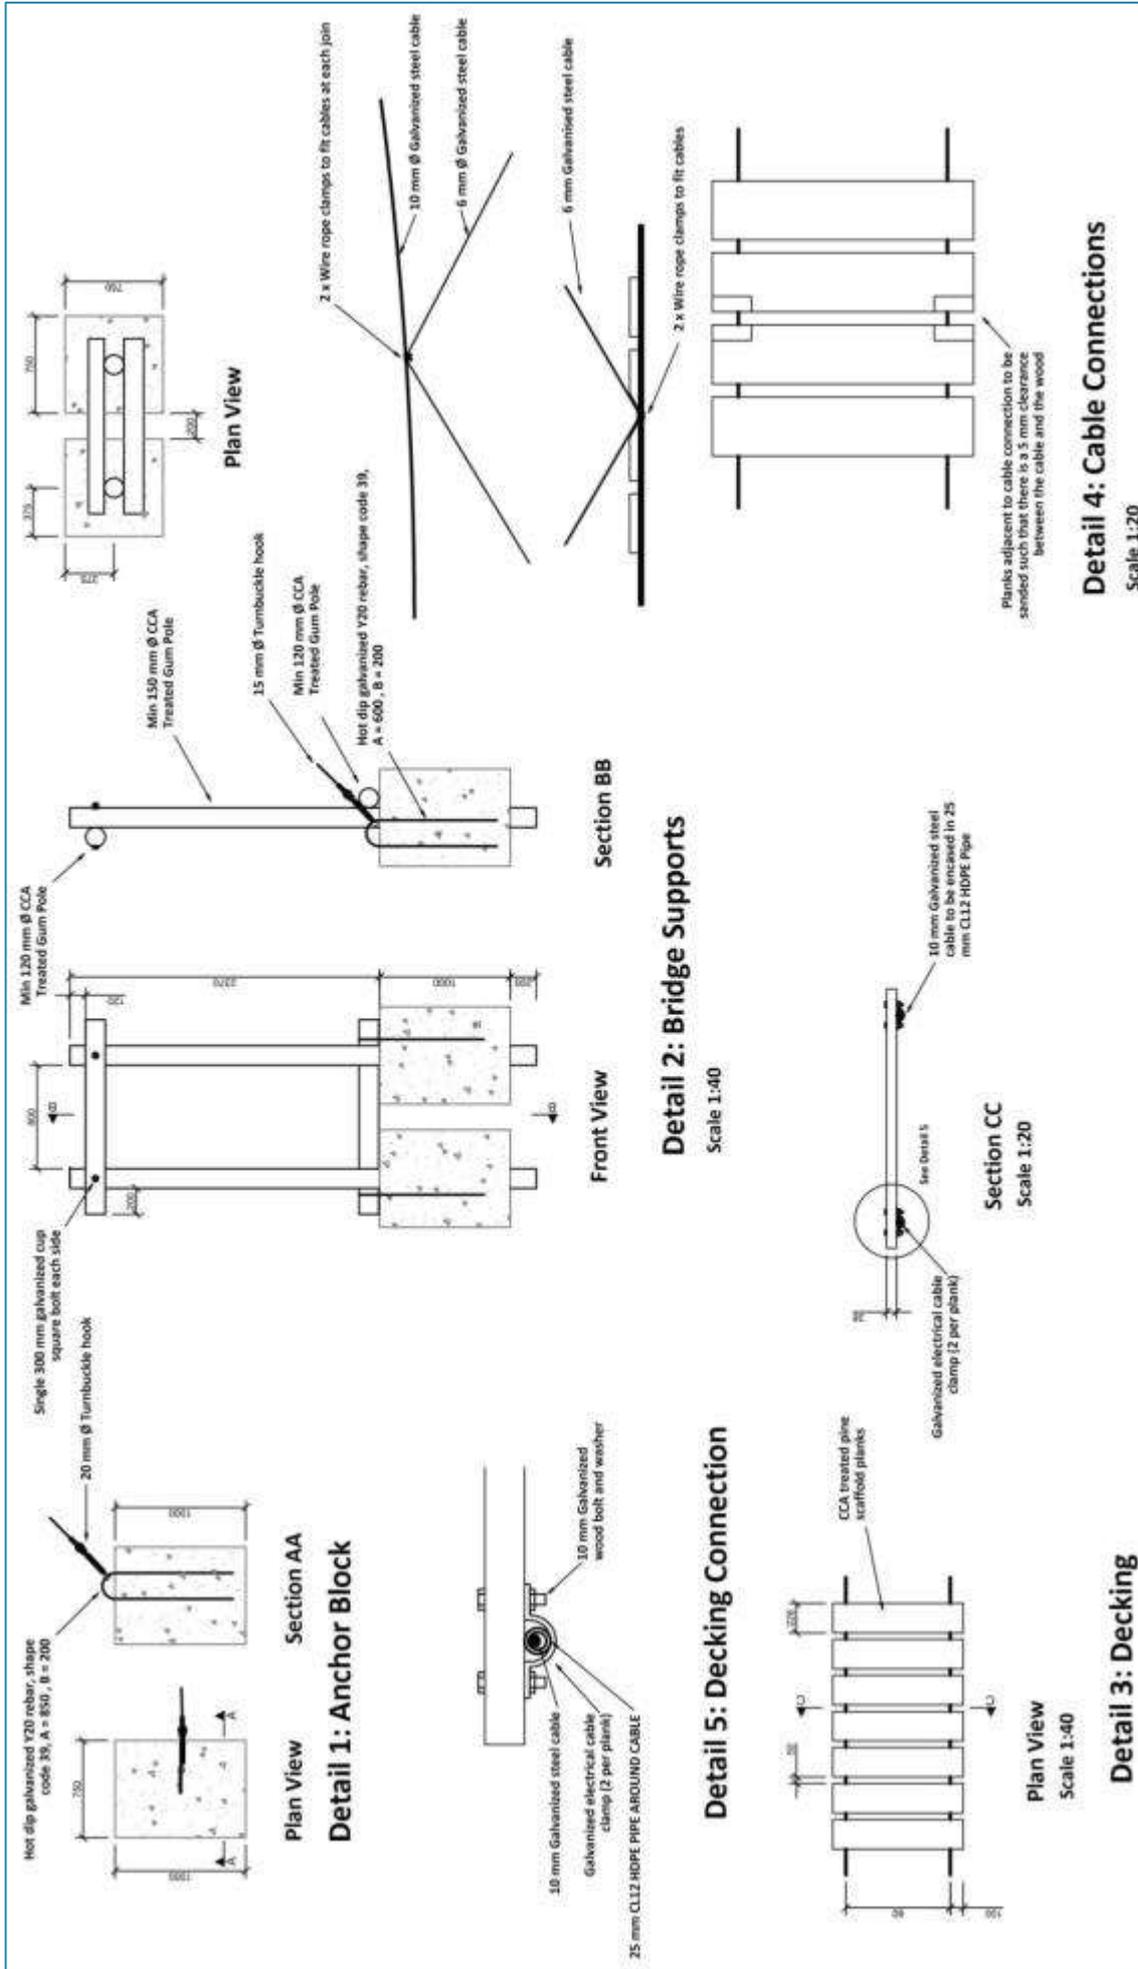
TYPICAL DESIGN DETAILS FOR A SIMPLE SUSPENSION BRIDGE
